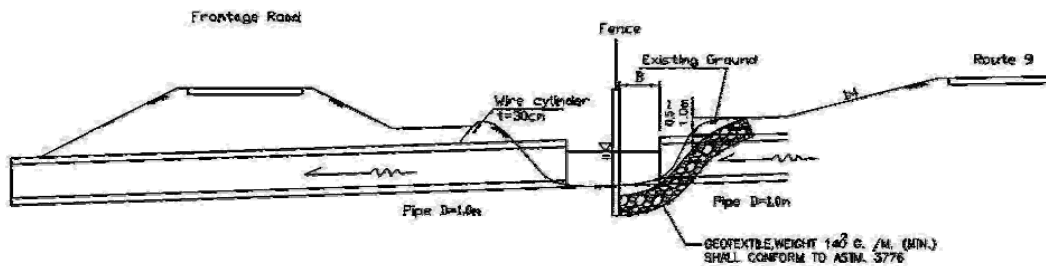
Protection Work at Inlet/Outlet of Drainage Facilities
